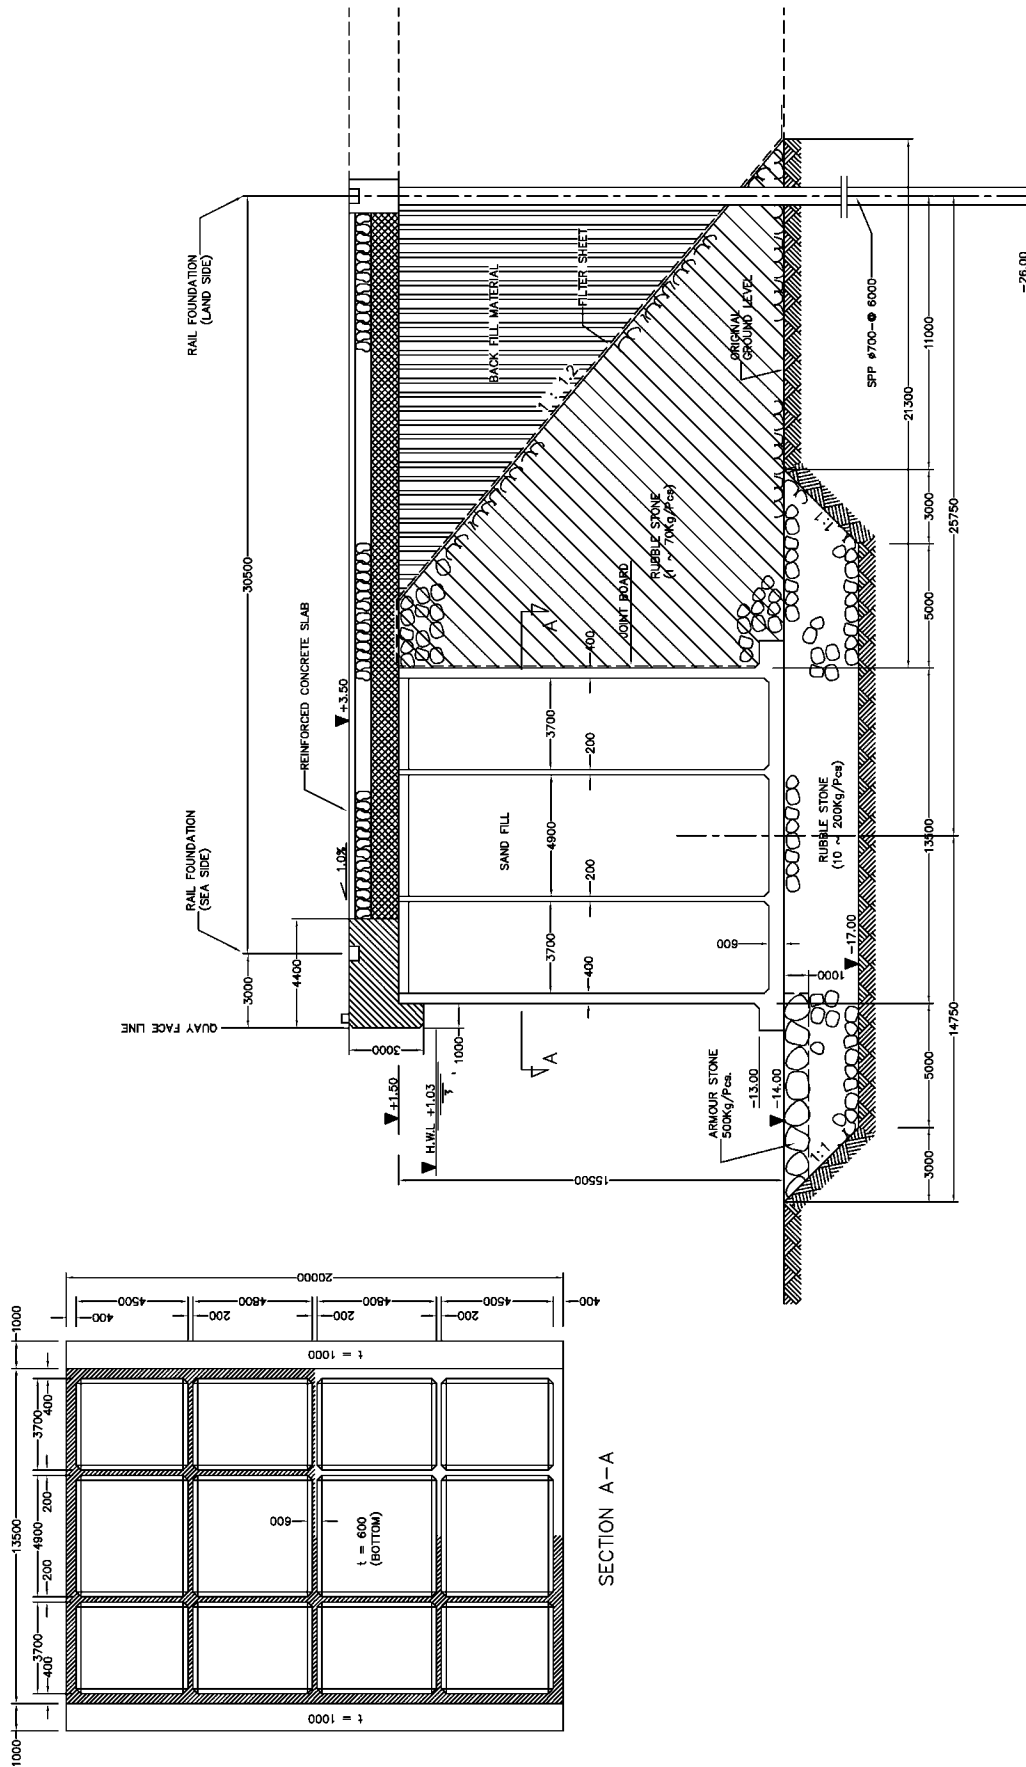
C-2 Typical Cross Section of Container Quay Wall of Bojonegara
